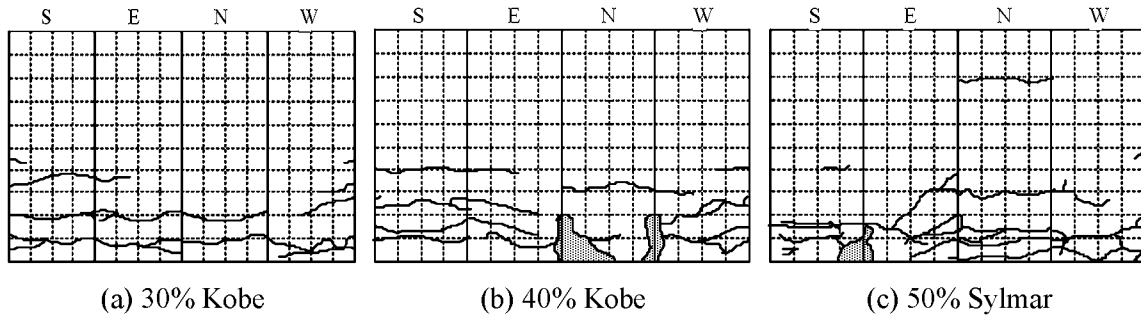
Failure Modes after the Unilateral Hybrid Loading
